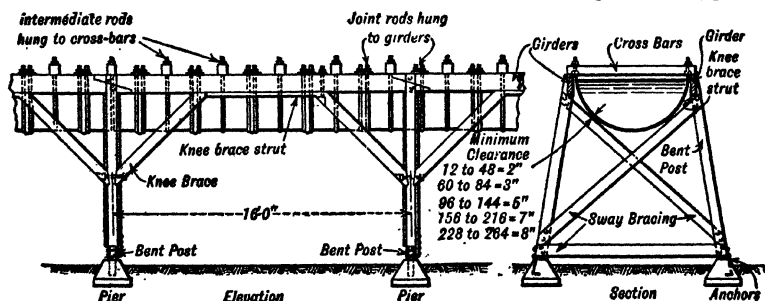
Details of Typical Semi-circular Steel Flume. California Corrugated Culvert Co., Berkeley, Calif.
